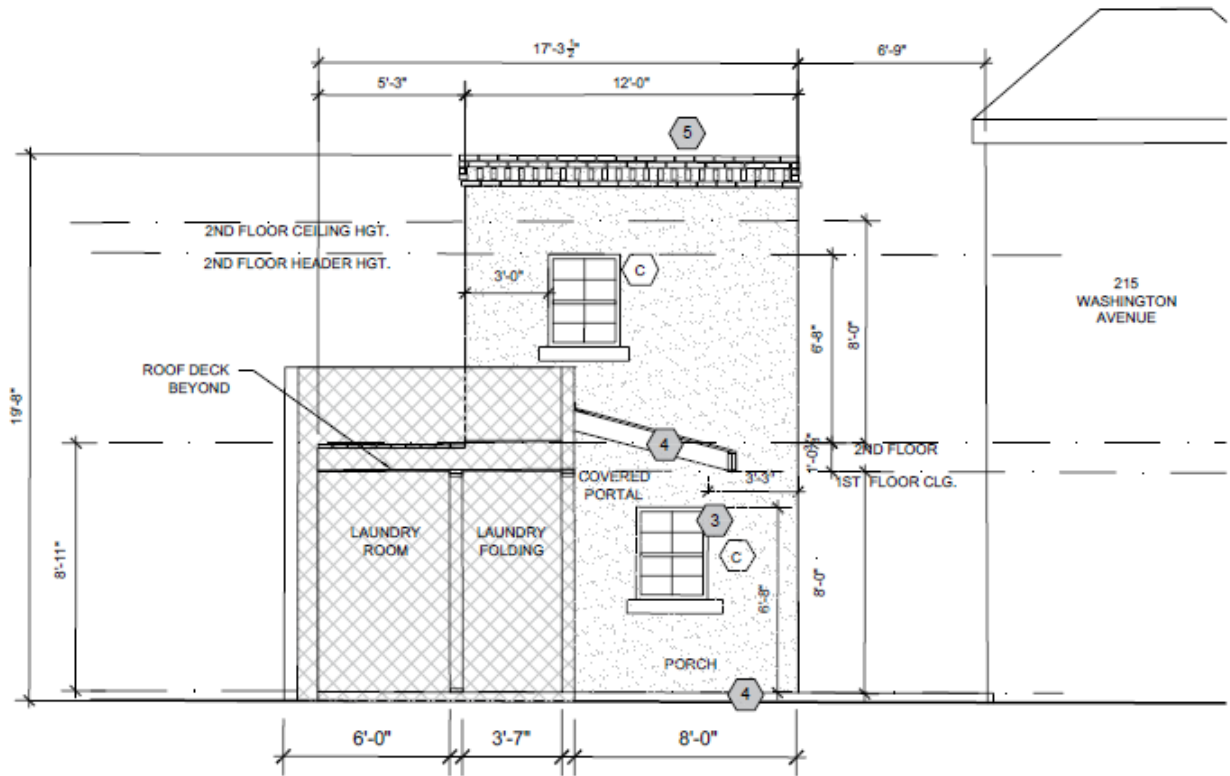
Proposed 219 Washington Ave Second Story Addition West Elevation.
